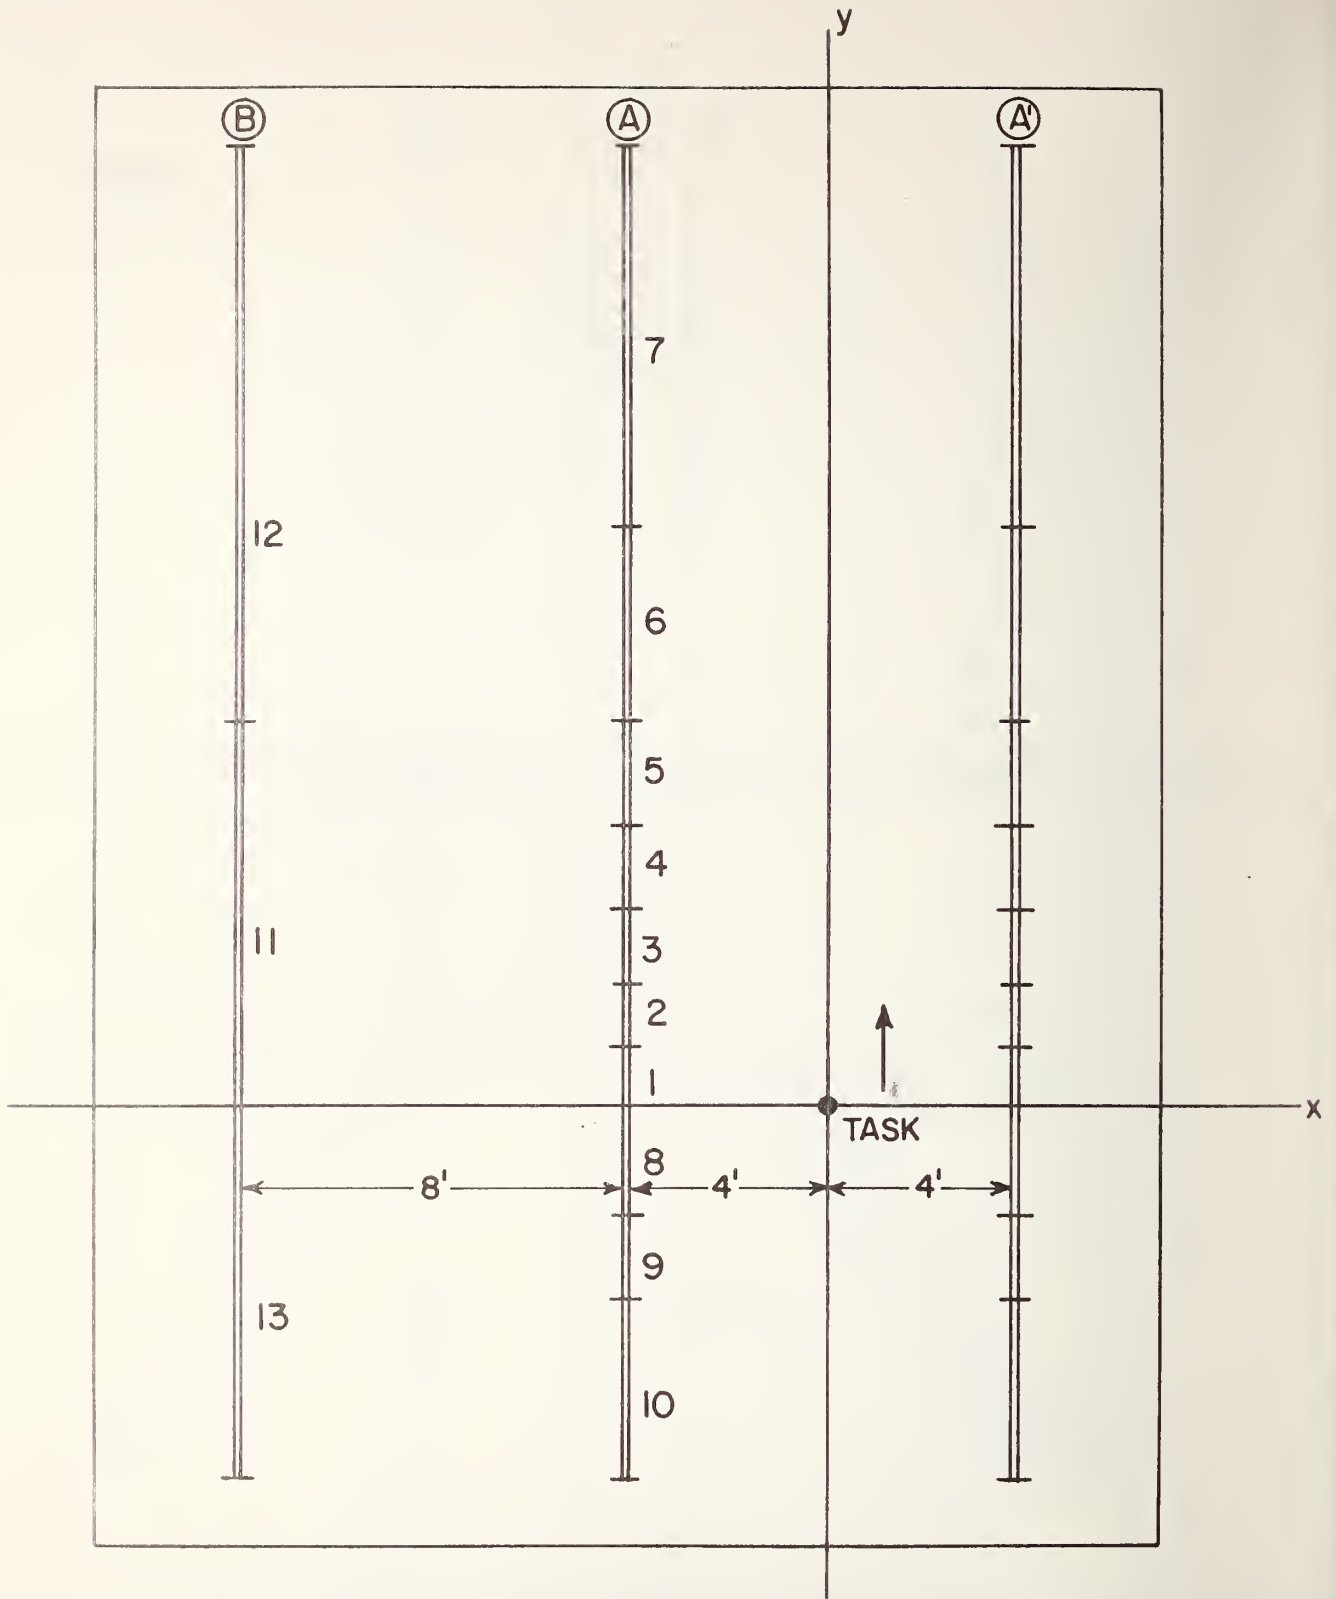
Lighting Layout Diagram for High Pressure Sodium Installation (Point Luminaire).
